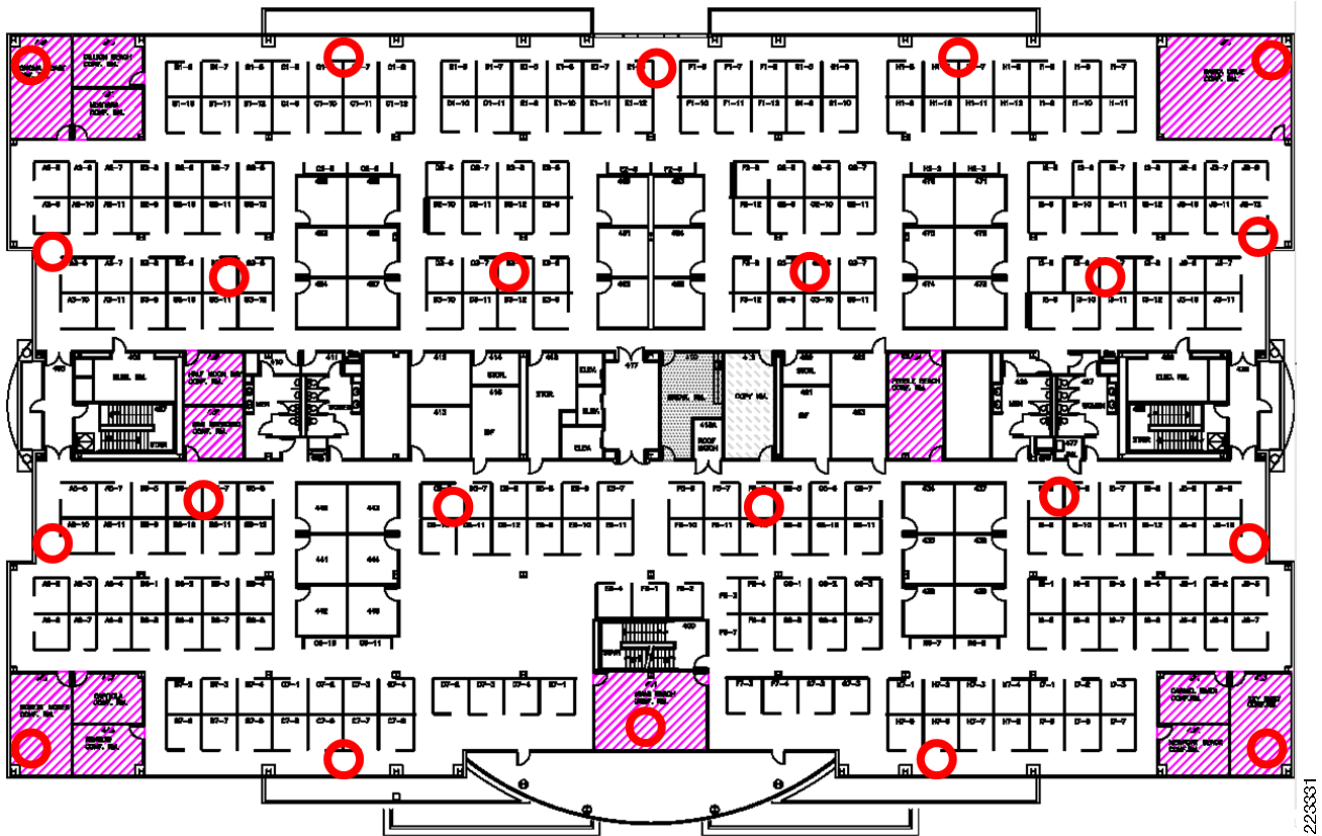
shows an example of location aware AP placement that illustrates access point placement and inter-access point spacing, offering a foundation for a location-aware design. The environment in Figure 15-4 consists of drywall offices and cubicle office spaces with a total space of approximately 275 feet by 159 feet. Taking into consideration the location tracking requirement for illustrative purposes only, our inter-access point linear-spacing recommendations of 40 to 70 feet suggests approximately 22 location-aware access points as an initial estimate. Incorporating the placement strategies made in preceding sections, interior, perimeter, and corner access points are placed to facilitate multi-lateration and establish a clearly delineated convex hull around the floor.
